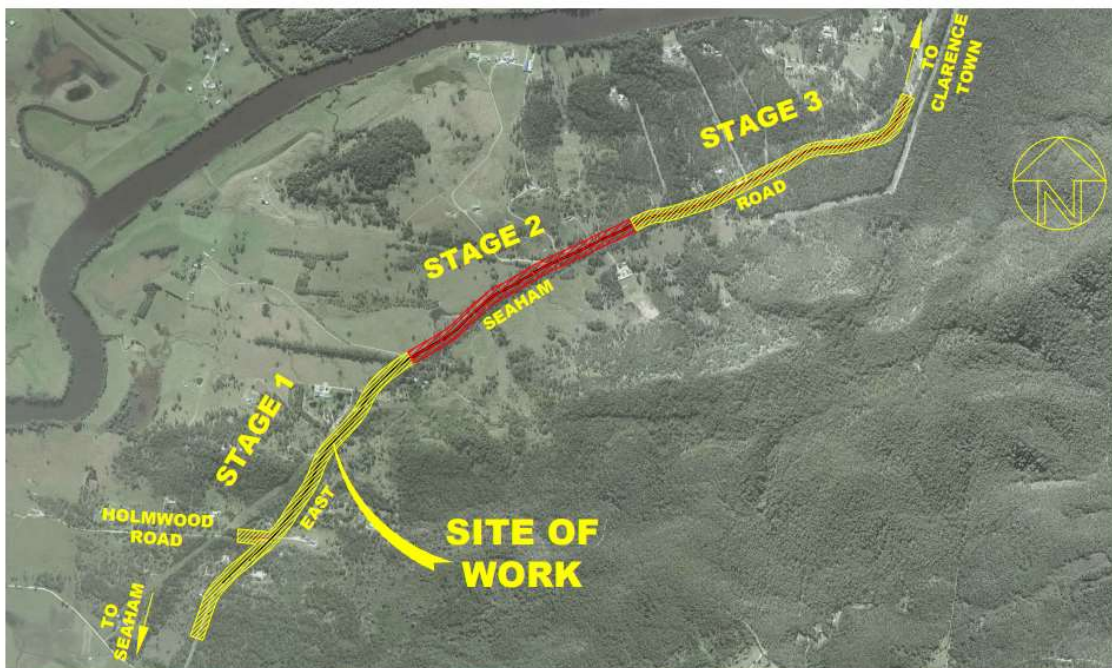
Location of Stage 1, 2 and 3 works on East Seaham Road
